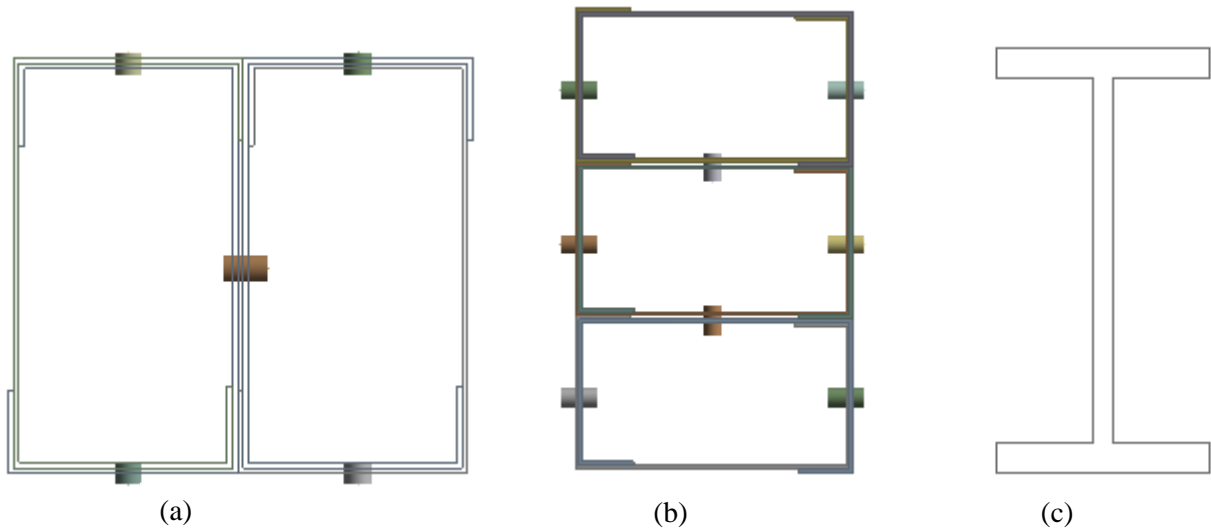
Geometrical Cross Sections of (a) 2 Limbed columns, (b) 3 Limbed columns, (c) I section
